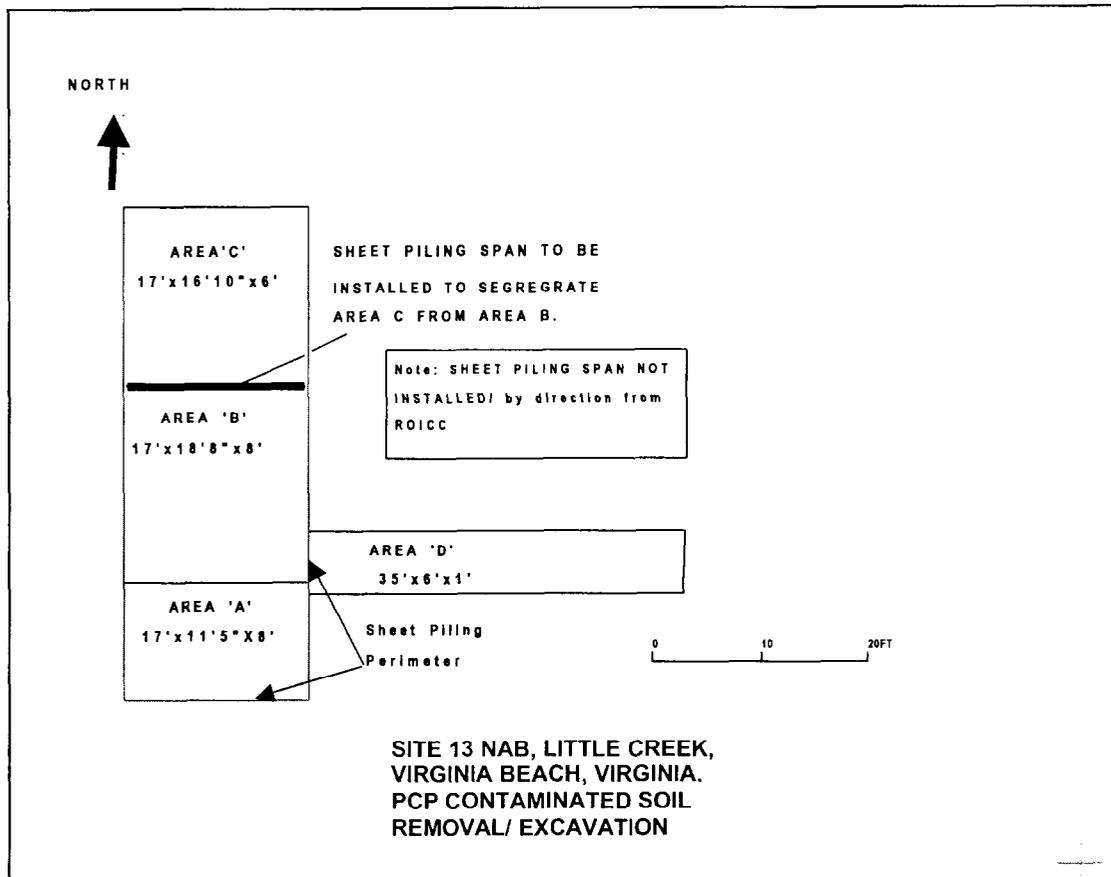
SHEET PILING AREA AND SEGREGATED SECTIONS OF EXCAVATION
